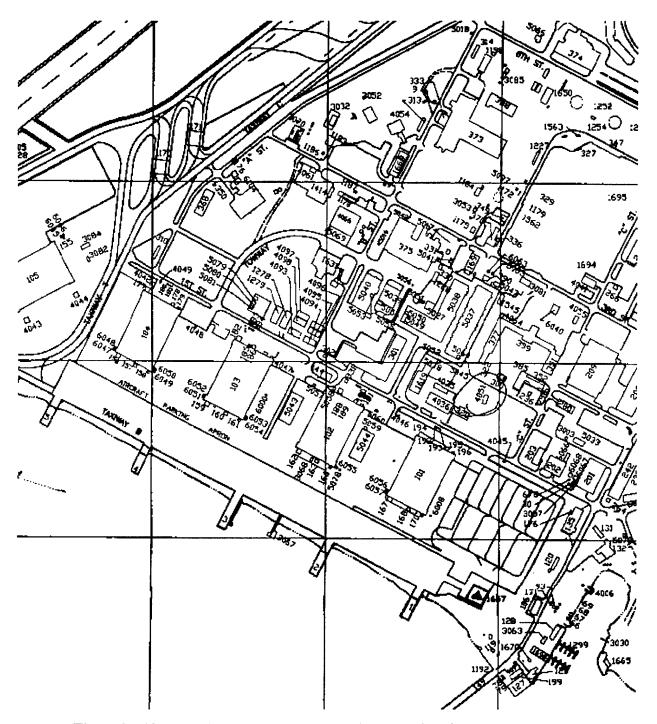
Drawing of the site layout of the Marine Corps Base Hawaii.
